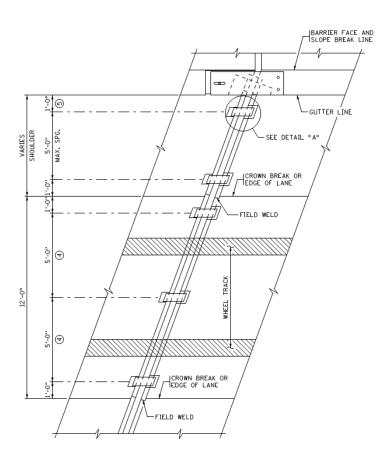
MnDOT plan of strip seal joint (with plow fingers)
